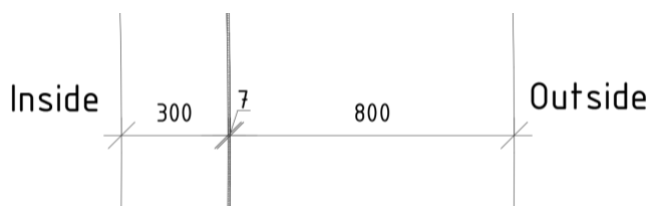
Section of cylindrical containment wall used in the case study; measurements given in mm.
